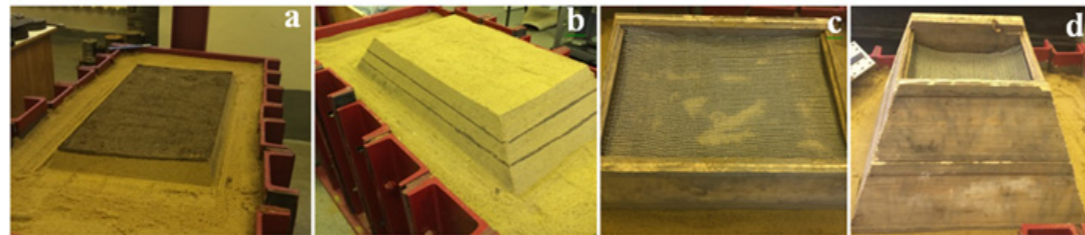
Dam model level-by level placement without (a,b) and with (c,d) reinforcement
